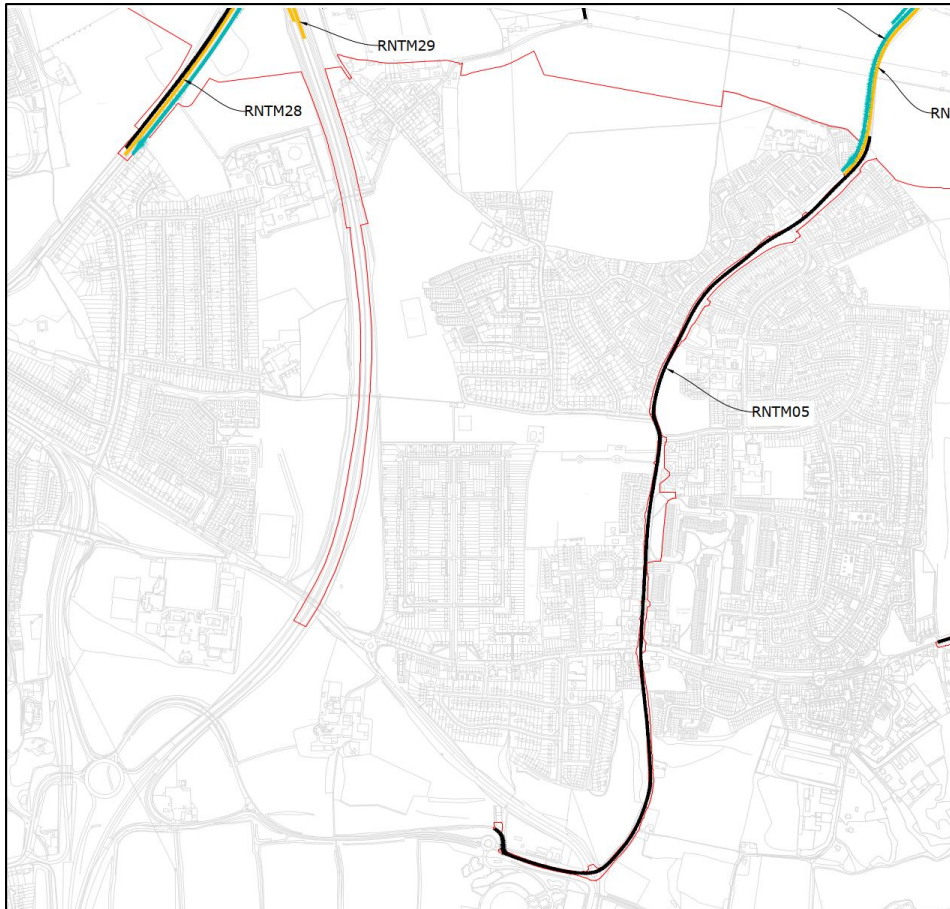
Roads North traffic management measures location plan (4 of 8)
